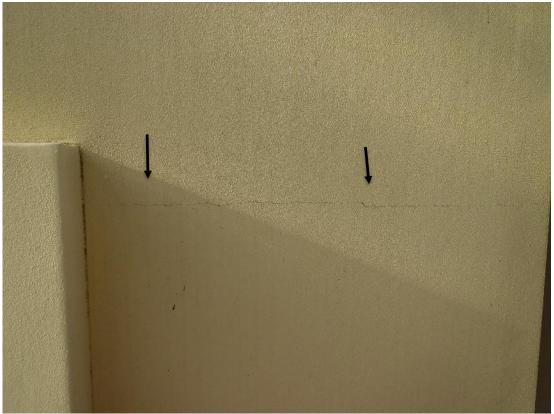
shows horizontal cracking to the common front boundary wall with the adjoining property, No. 70 Nancy Street.
